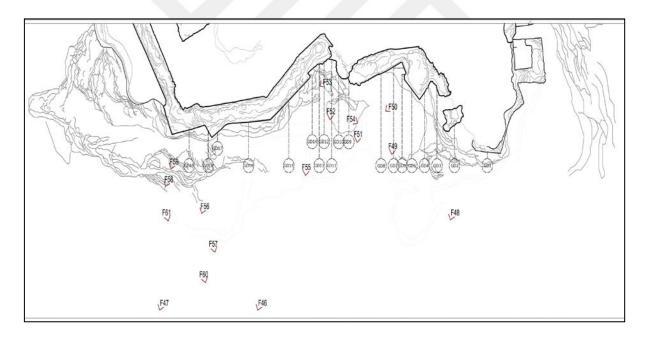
South Side Exterior Walls Photo Aspects and Wall Encodings
